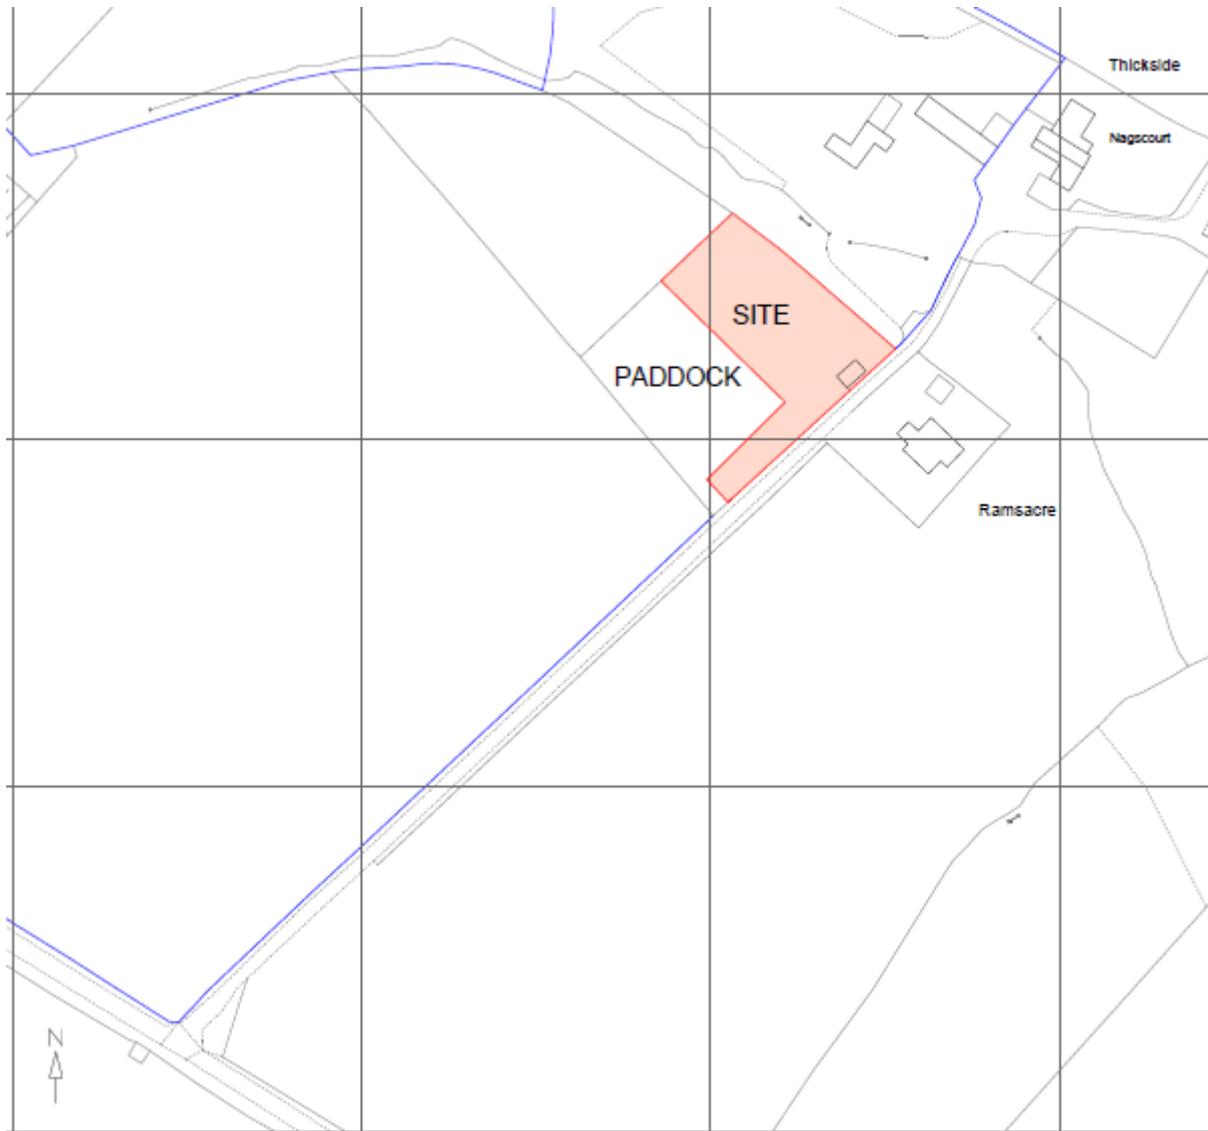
Extract from AH096-LP01(A) Location Plan, the adopted highway is visible in the south-west with the site lying to the north-east (Source: Aidan Hume Design)
